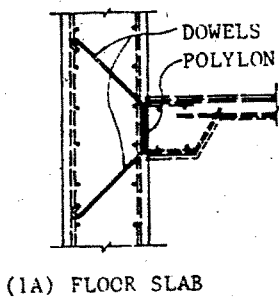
Connection of Reinforcement Bars to Permanent Structure
